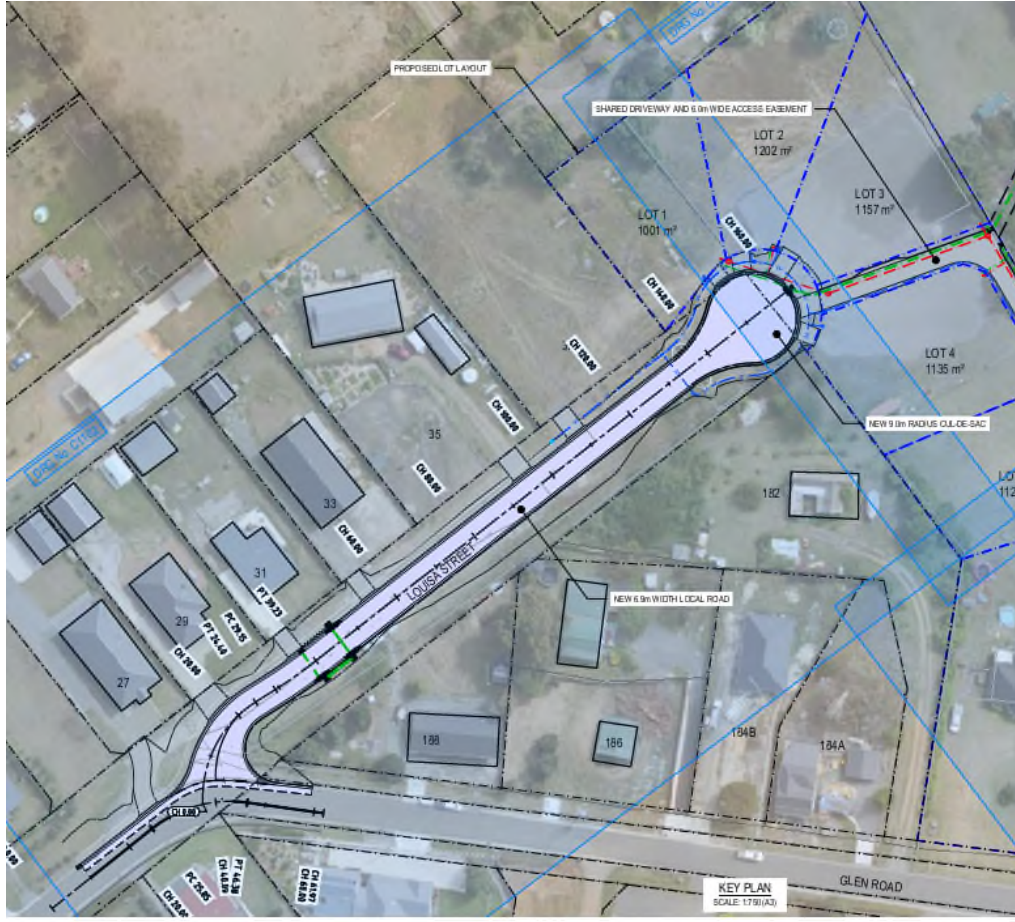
Engineering Design plan showing the construction of Louisa Street.
